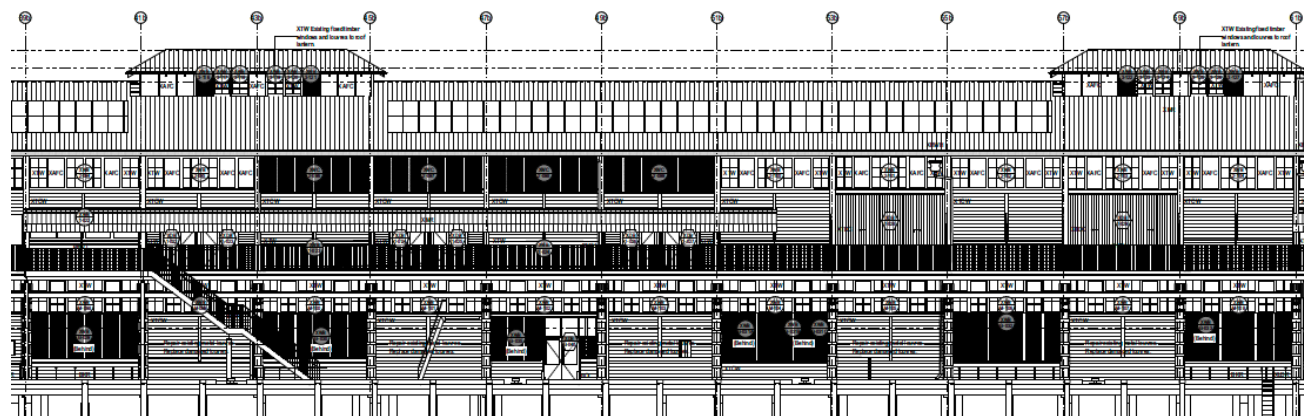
approved eastern façade (Plan A-222, 07/07/20)
